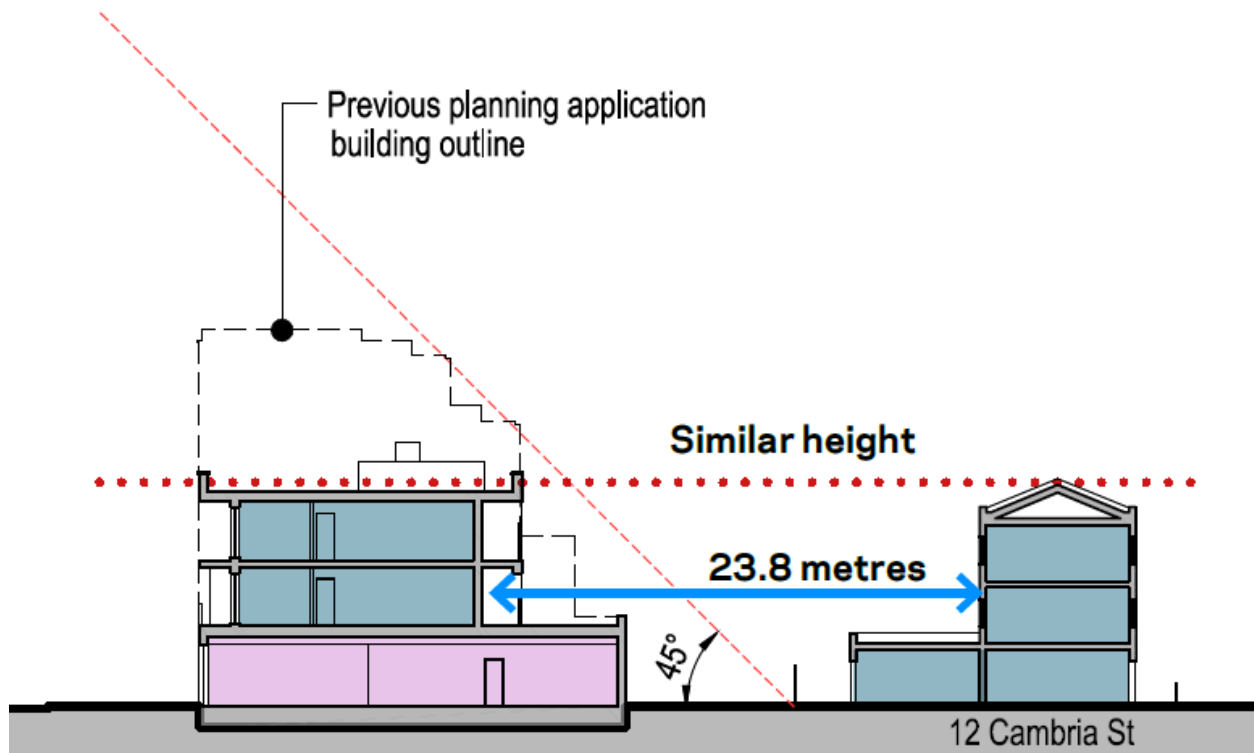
Cross Section - Proposed Block B and Cambria Street (outline refused scheme).
